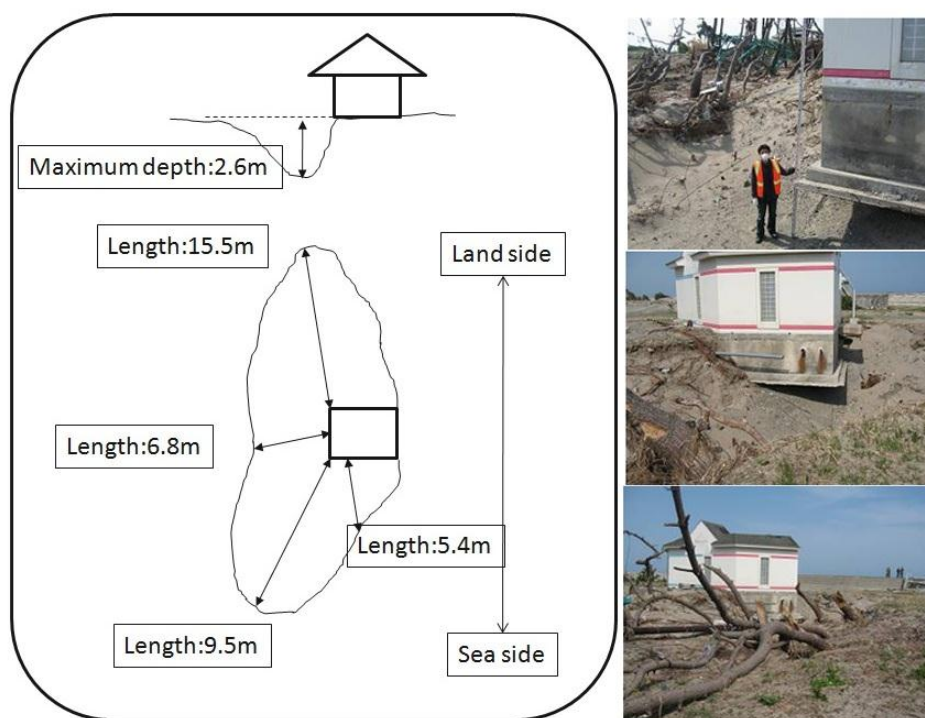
Scour pattern and multiple views of reinforced concrete structure: Arahama Beach, Sendai, Japan, May 16, 2011, two months after tsunami.
